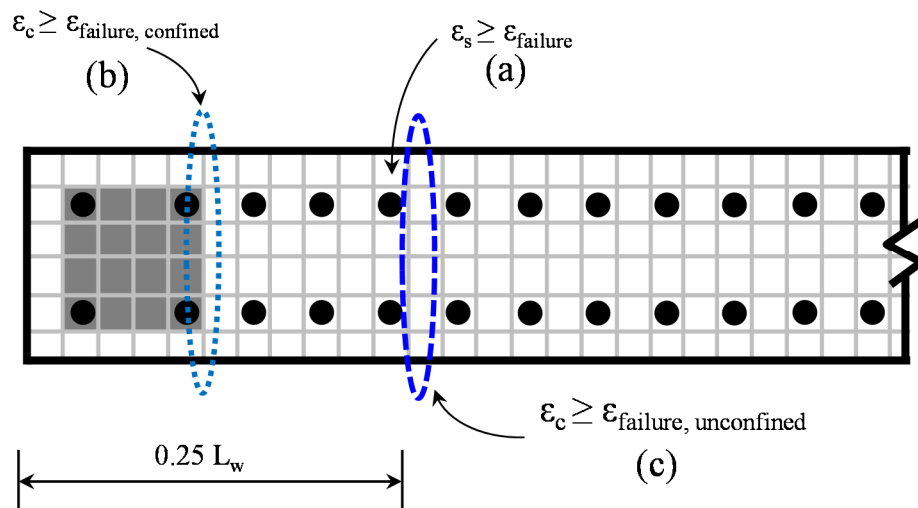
Reinforcing steel and concrete failure mode criteria: a) steel rebar failure; b) concrete crushing in confined region; c) concrete crushing in unconfined region
